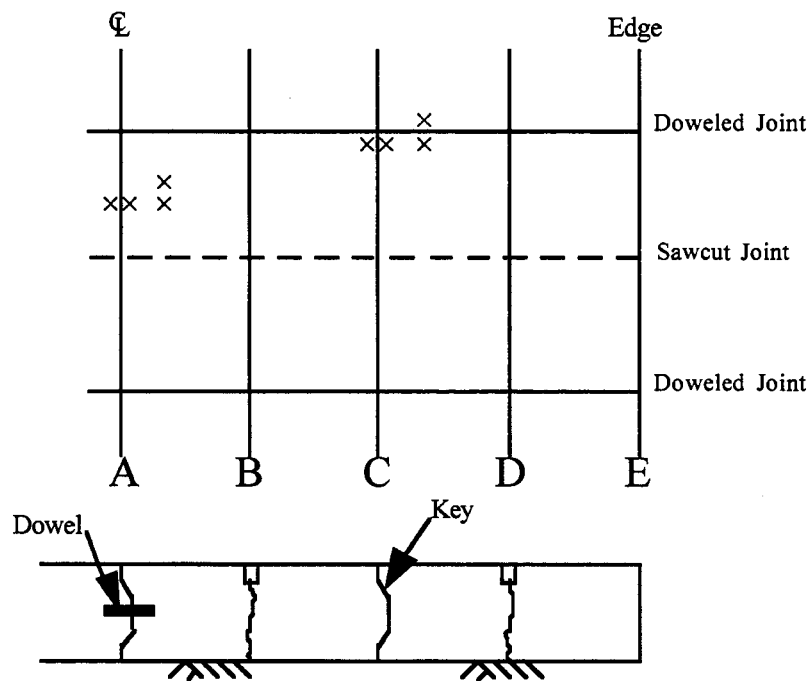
Slab Layout and RDD Test Configuration on Runway 17R/35L.
